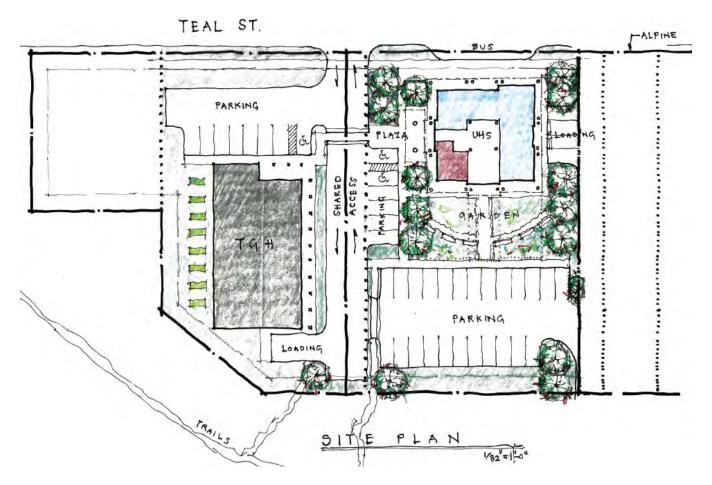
Site plan showing gardens between the office building and the parking lot, and along the west side of the Emergency Housing Shelter.
